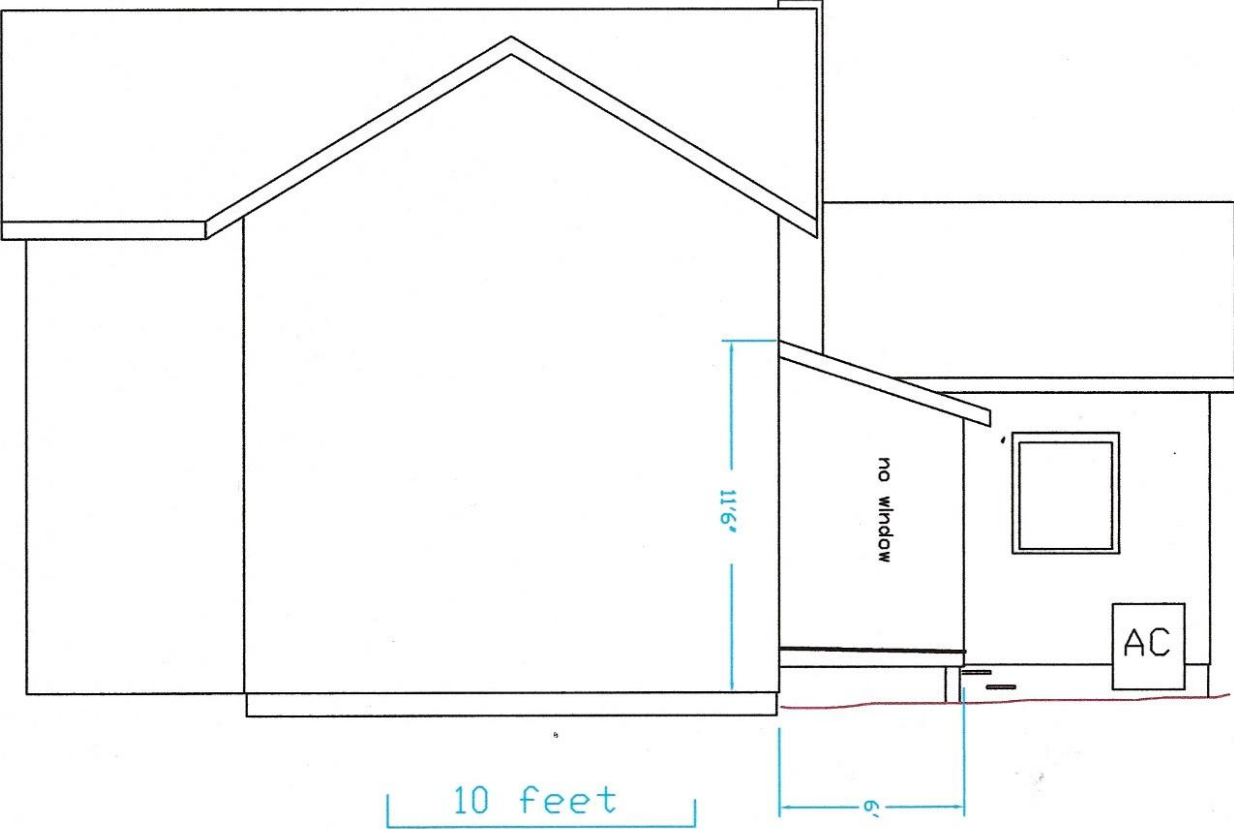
Proposed new view from west. Roof of new porch will be raised to meet kitchen roof. New window will be a slider that looks like the window on the north side of the previous kitchen addition (see photo 2).
